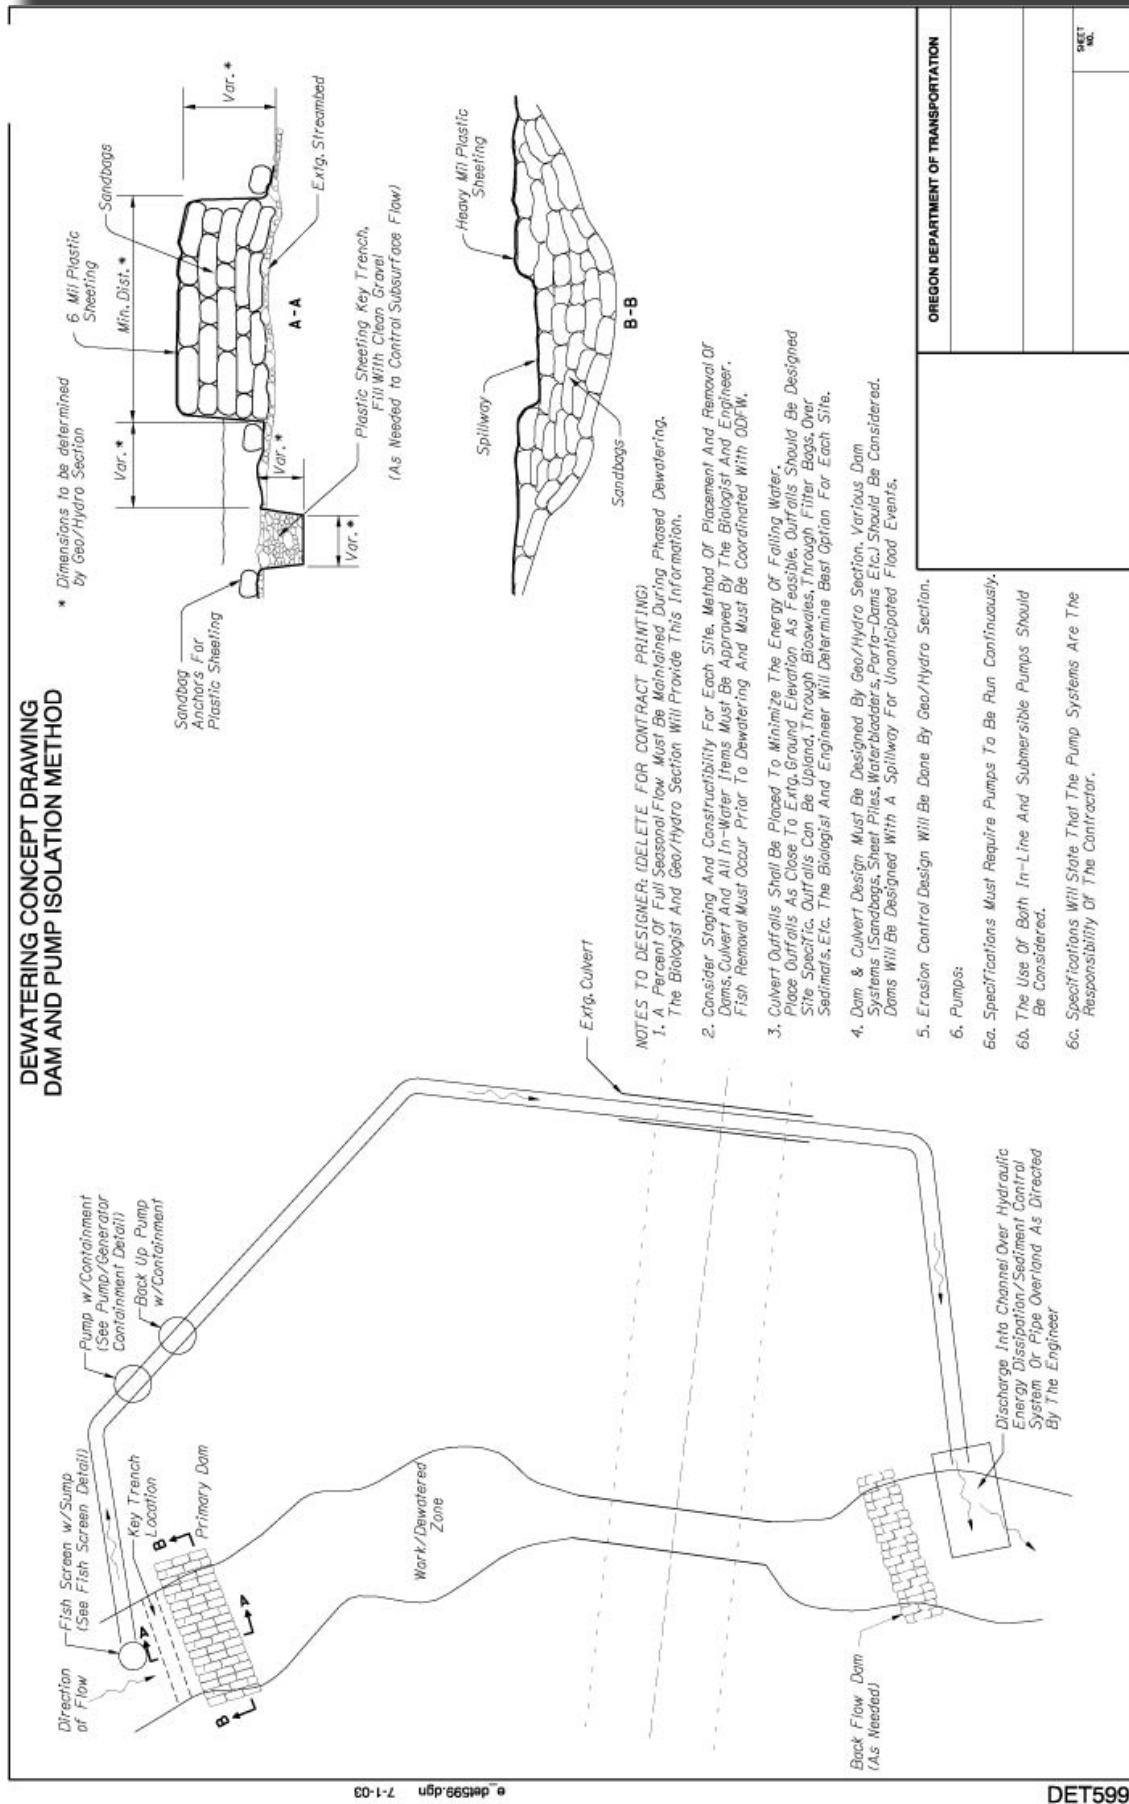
Typical dewatering plan—dam and pump isolation method—Oregon Department of Transportation.
